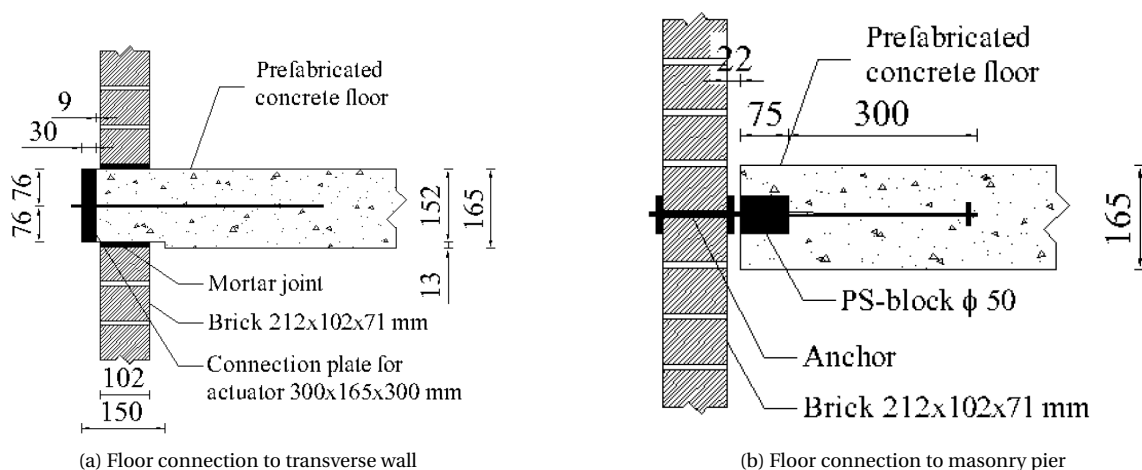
Construction detail of first floor connections as depicted by Ravenshorst *et al.* [1]
